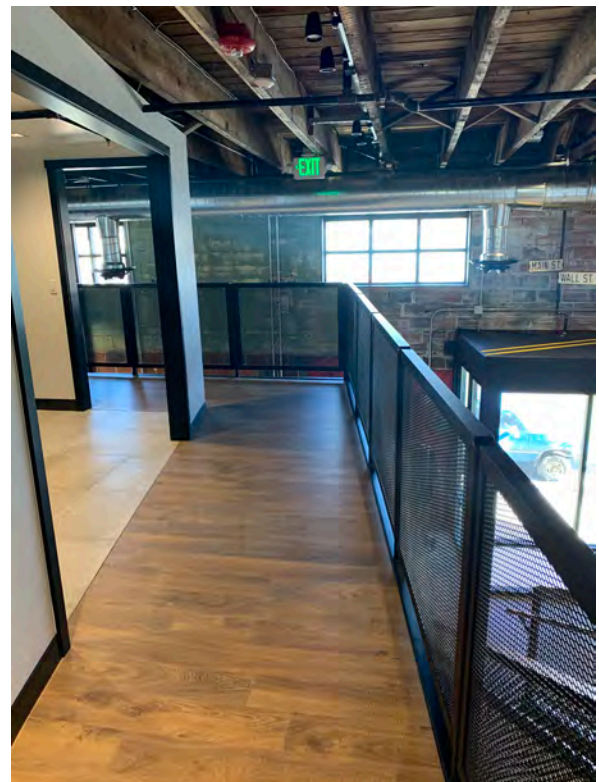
After: Mezzanine level added, looking from new lobby area to the north at west end.
